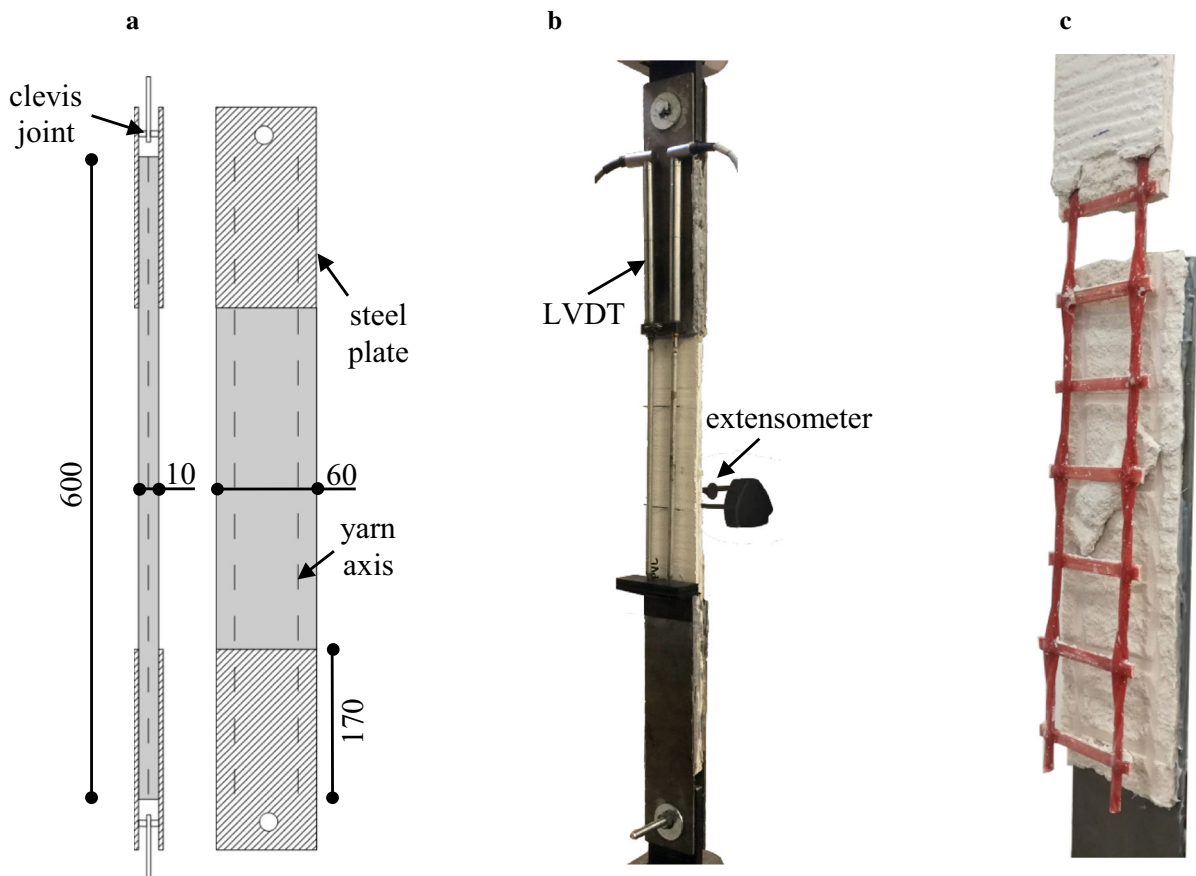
a Sketch of a CRM coupon subjected to the clevis-grip test (dimensions in mm). Specimen TC_G_600_60_Y_1 b during and c at completion of the clevis-grip test
